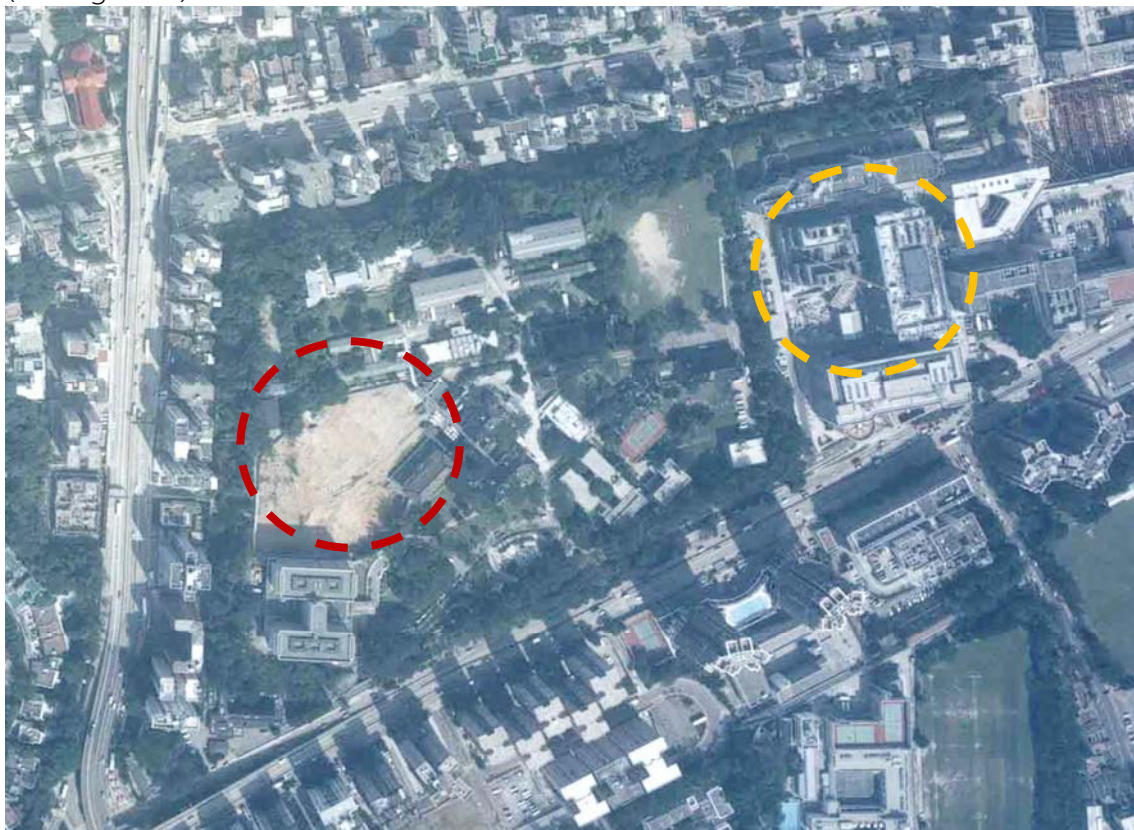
1998 aerial photo shows the Rehabilitation Building in completion stage (in yellow circle) and the foundation of Main Building (in red circle). (Source: Lands Department, 1998)
